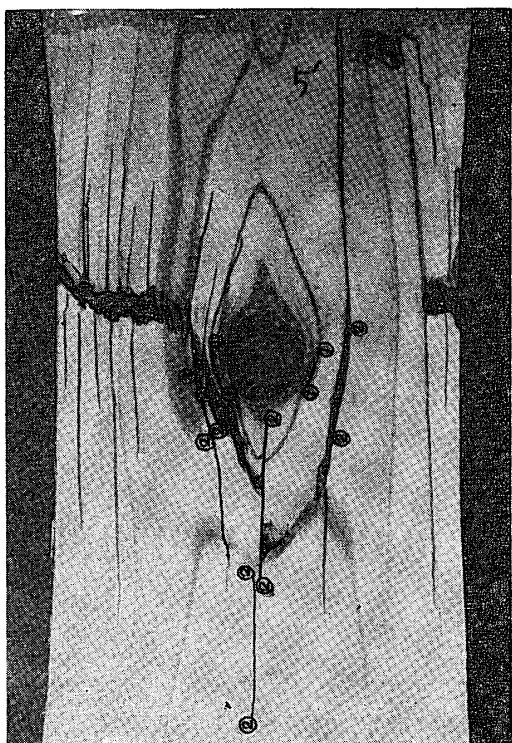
Pith side face of knotty specimen after failure test (Specimen No. 5).
